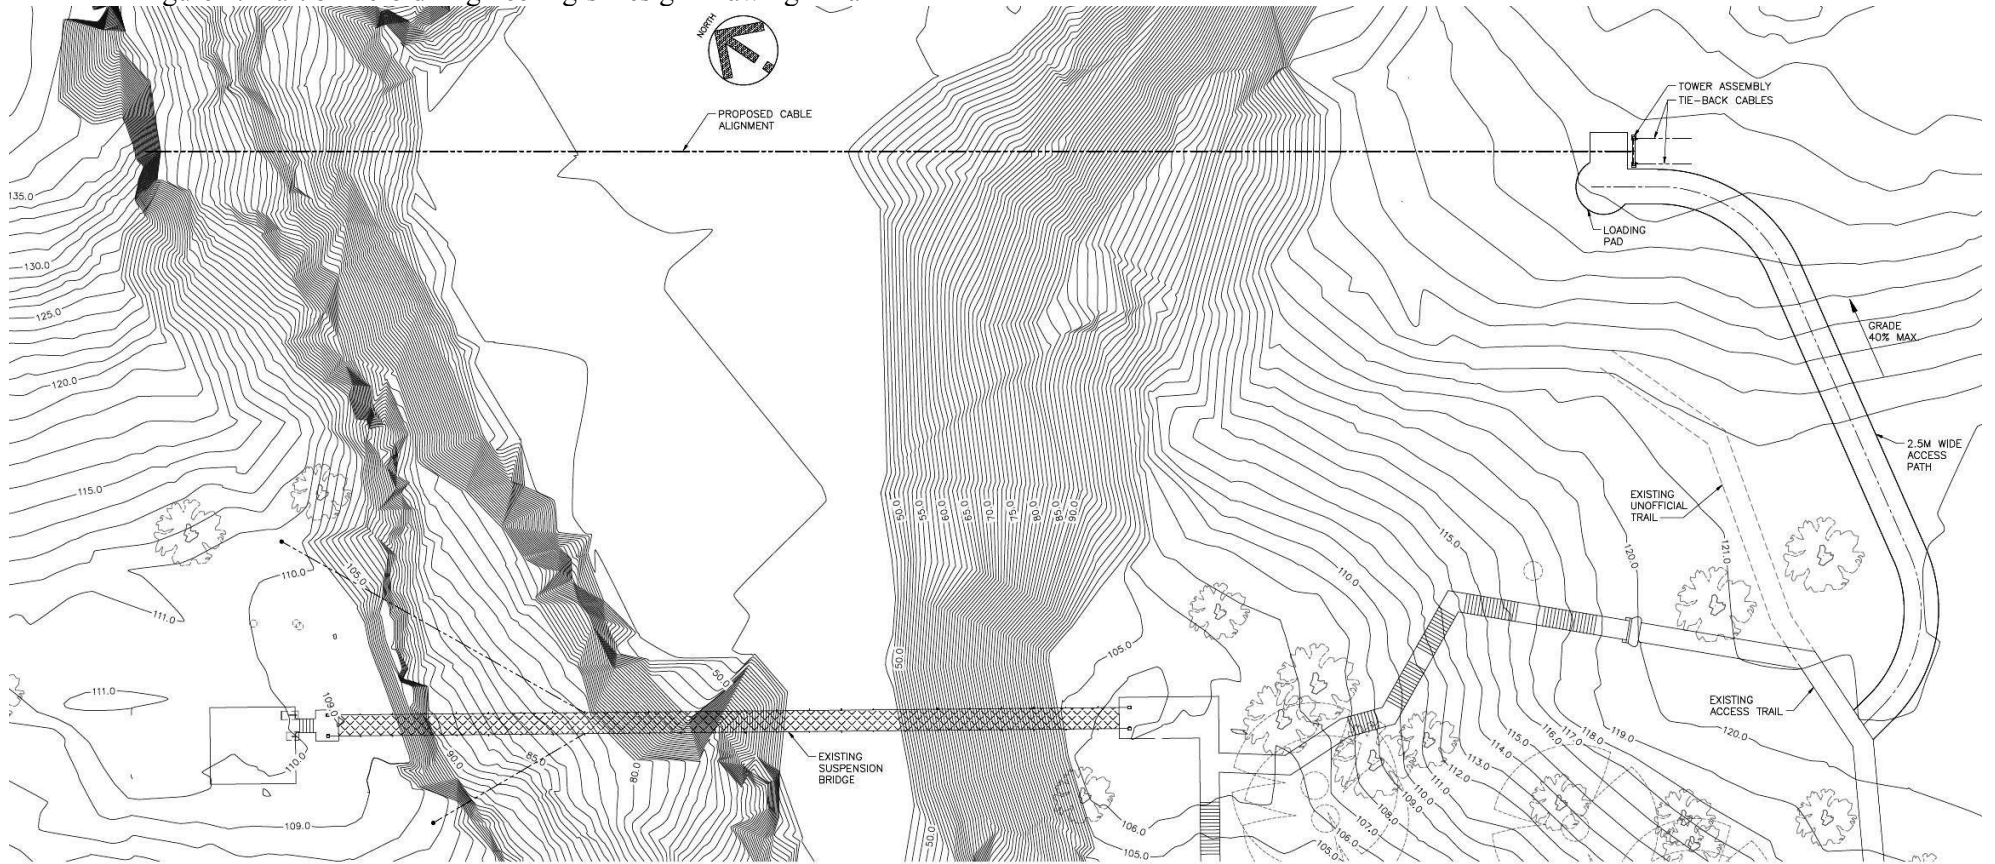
Part of Herold Engineering's Design Drawing - Profiles
